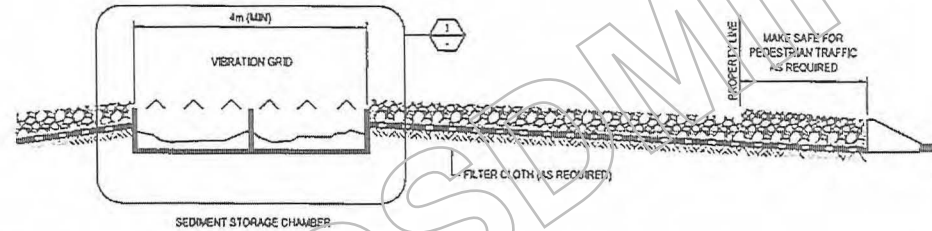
TYPICAL LAYOUT OF VIBRATION GRID WITH ROCK RAMPS
